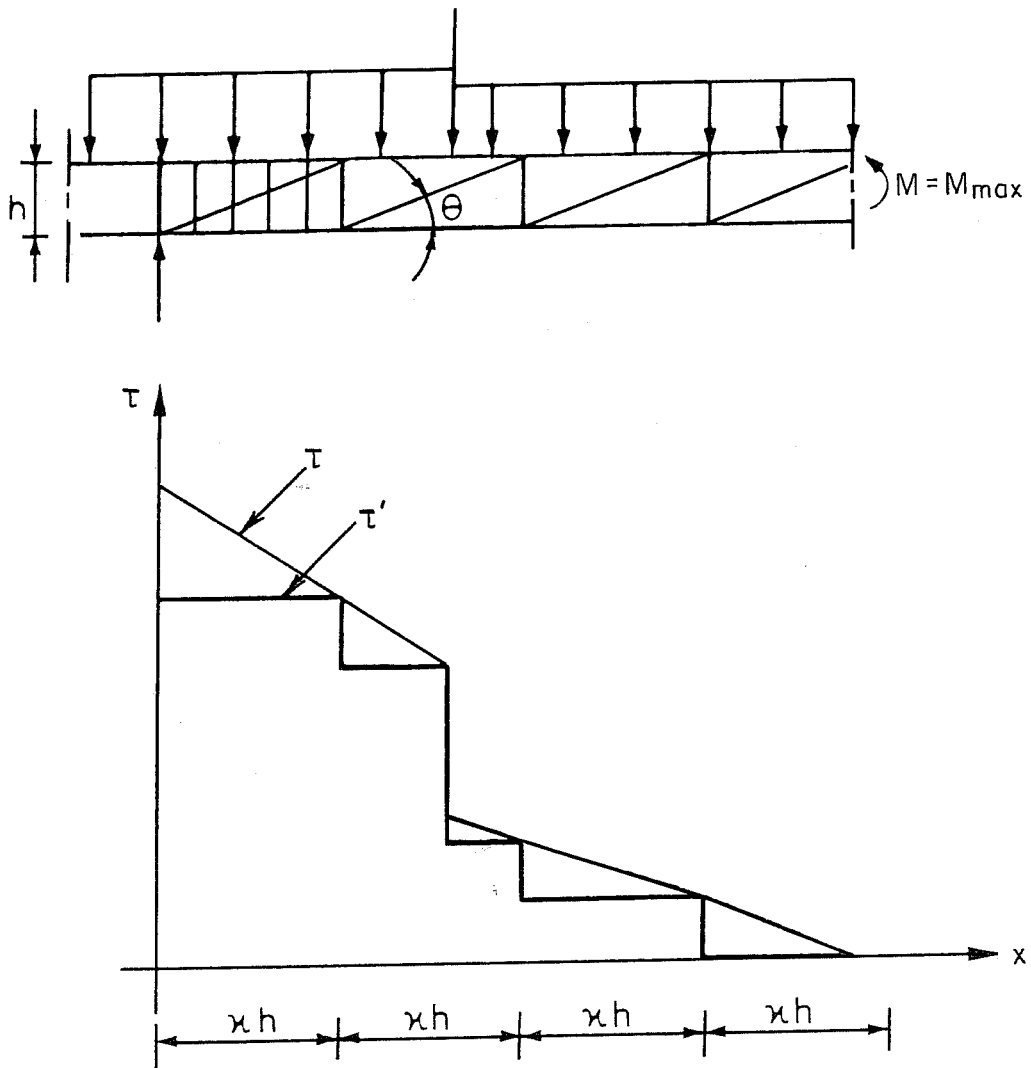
Shear design zones using the Danish model [Ref. 32].
